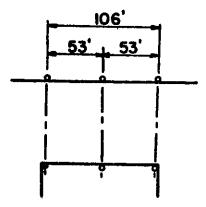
TYPICAL STRAIGHT TAXIWAY SECTIONS - MORE THAN 200 FEET
